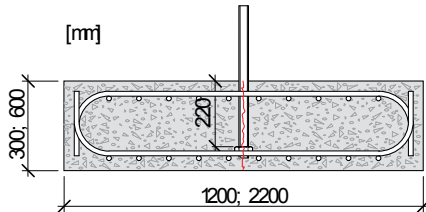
Typical test slab with cast-in threaded rod and nut, top and bottom reinforcement and initial crack going through the location of the rod.
